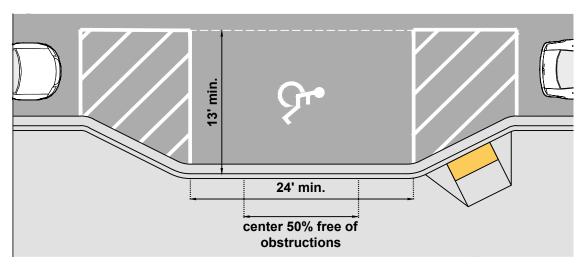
Minimum 50% clearance required adjacent to accessible parallel on street parking space
